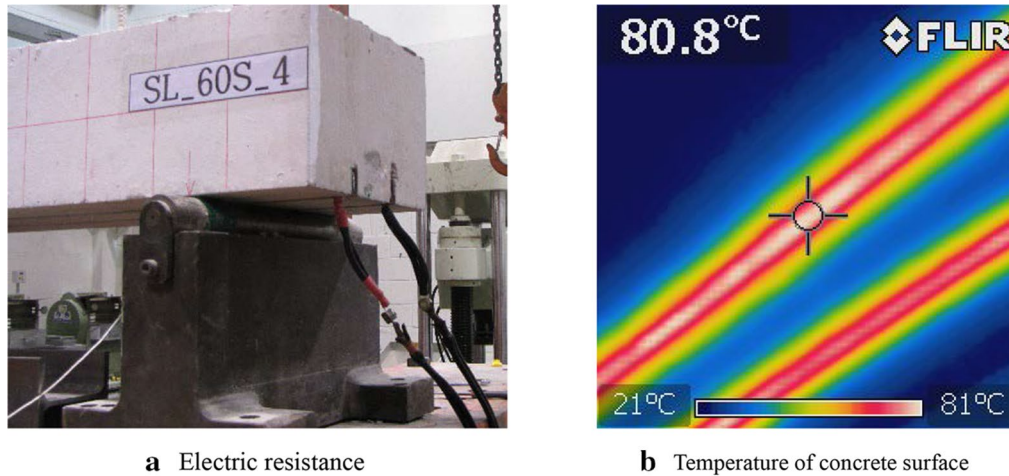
Details of the bonded Fe-SMA inside the concrete beam.
